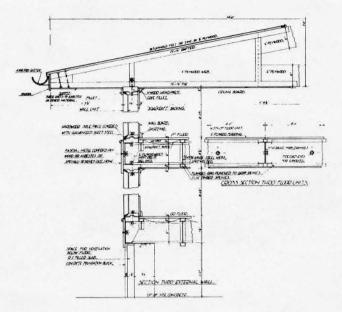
Tarran System of Construction — Structural details for two-storey house.
